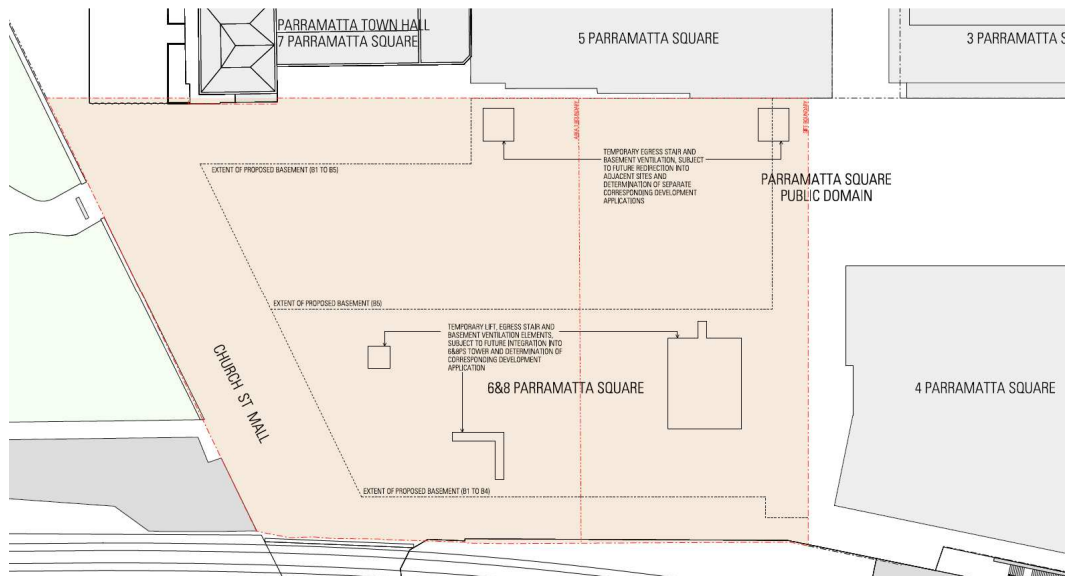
Basement Footprint (Source: JPW Plan DA-A-6-0060-B Rev.00 19/12/17)
